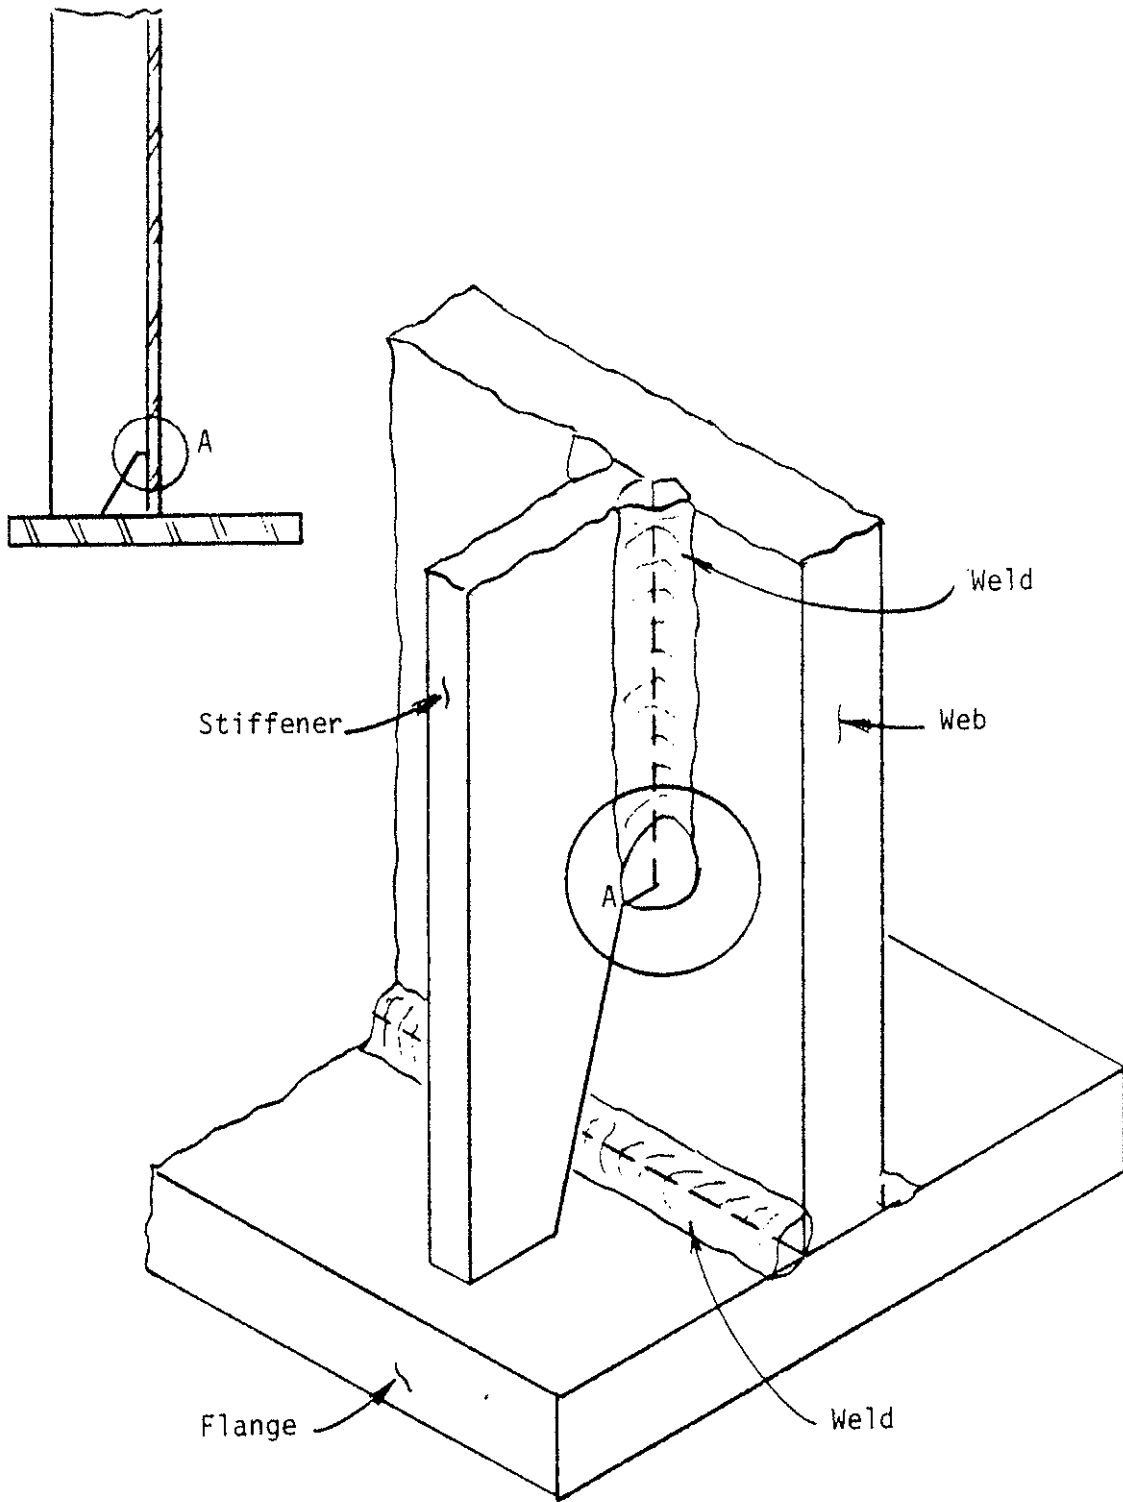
Fillet Weld Termination at Notch A
